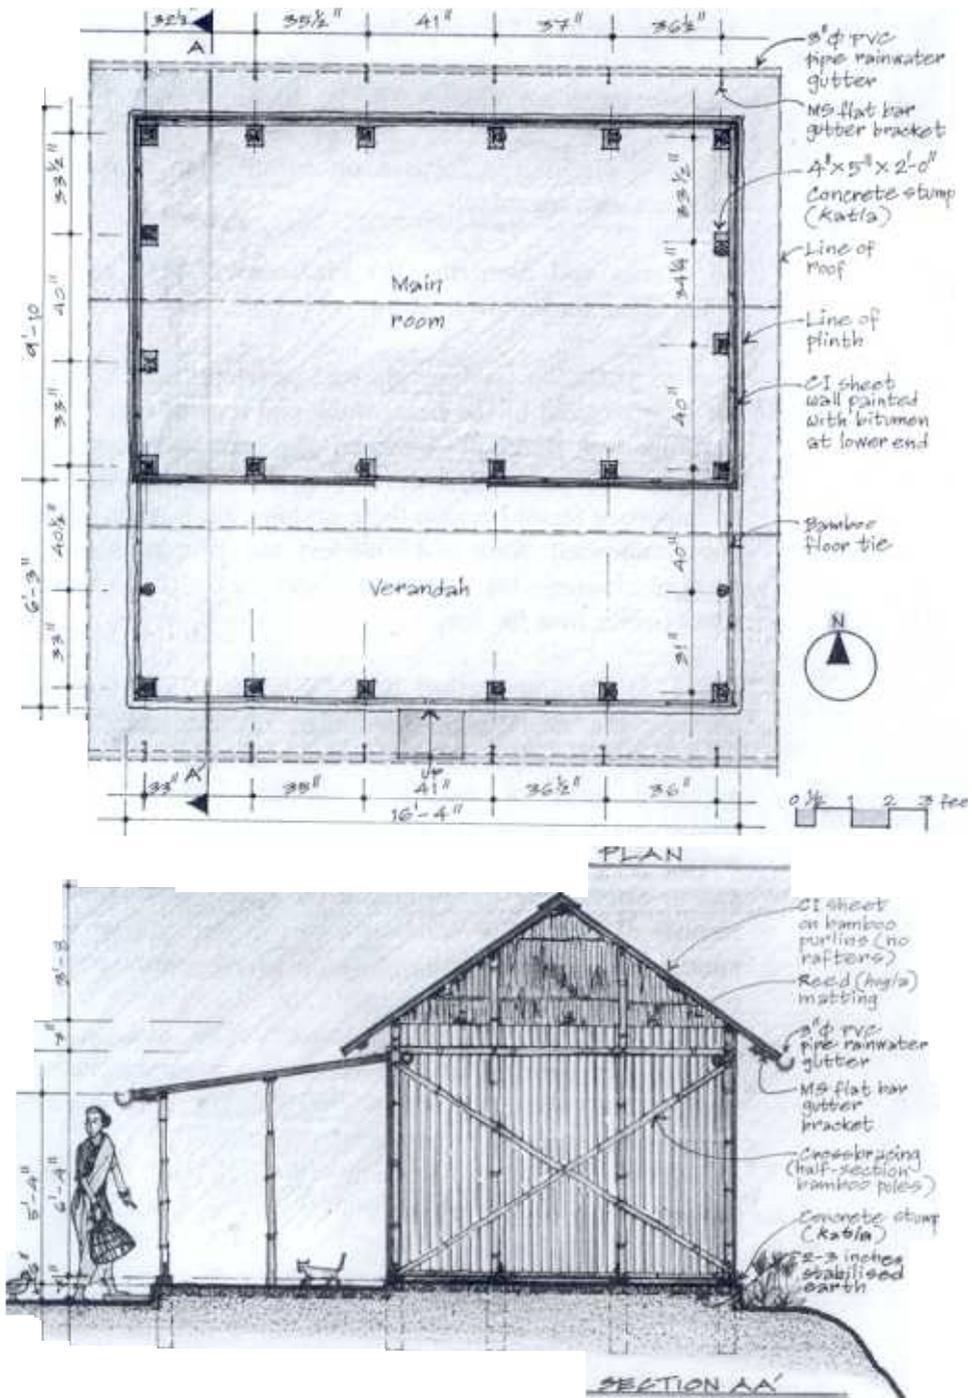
Plan and Section of a Demonstration House (DH1)
